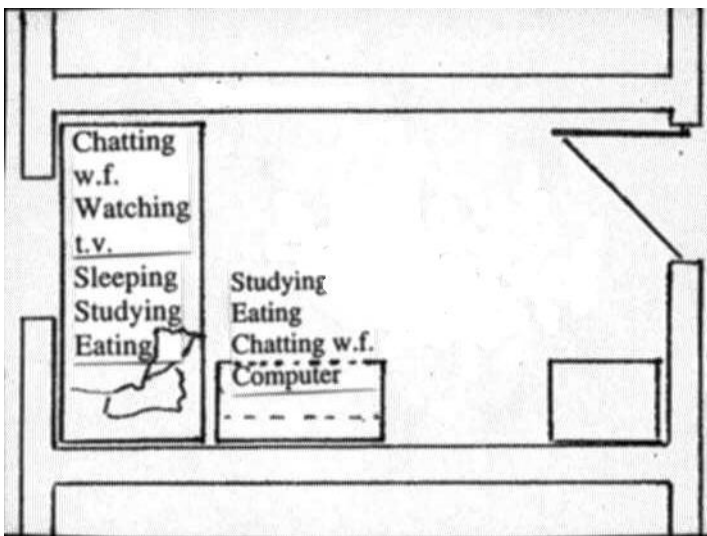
Layout Indicating Overlapped Activities in the Changed Layout (Plan B).
